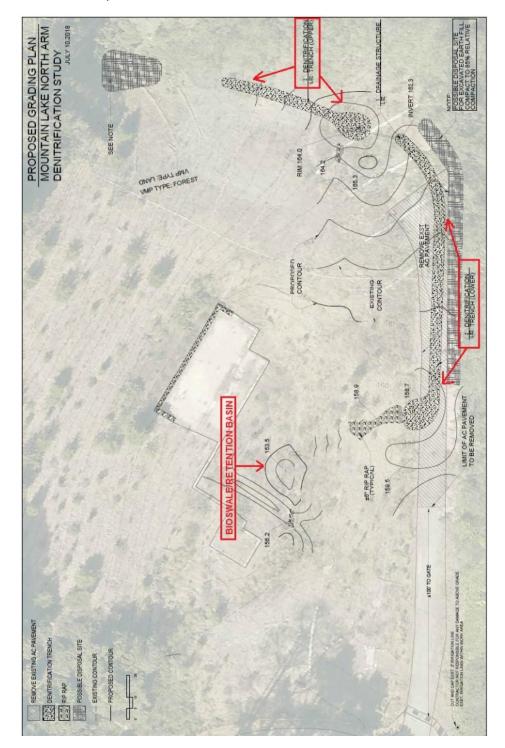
construction plan of north arm de-nitrification trenches and bioswale
